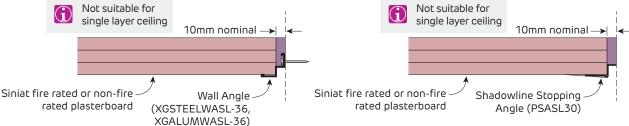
Finishing Detail - Shadowline Wall Angle
